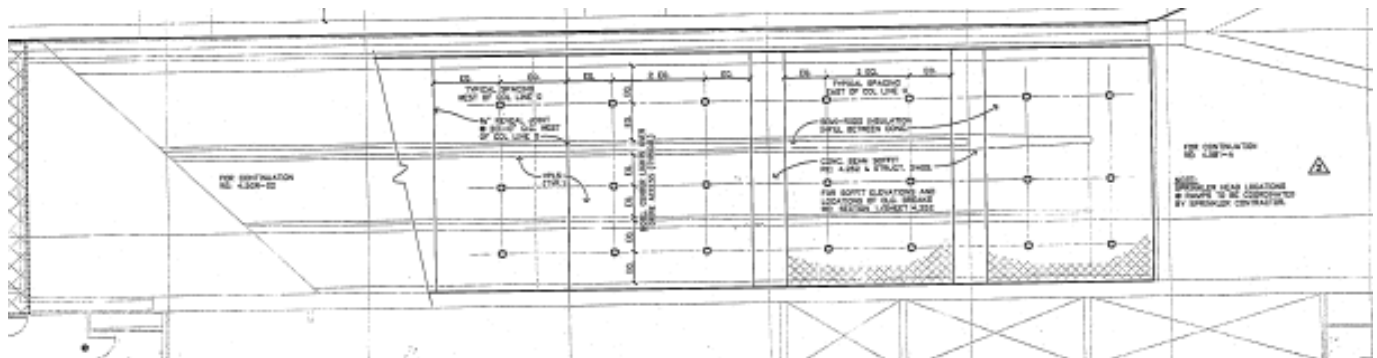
14<sup>th</sup> Street North Ramp Reflected Ceiling Plan – B1 Level
